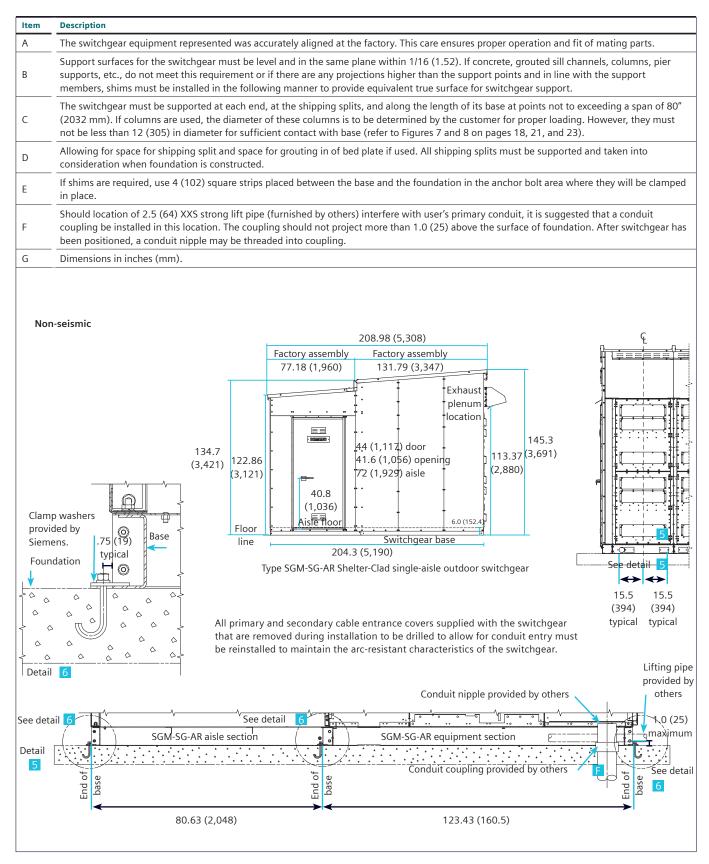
Anchoring outdoor type SGM-SG-AR Shelter-Clad single-aisle switchgear rated 27kV (continued)
